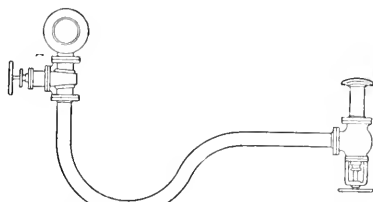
Boiler and header connection when header is higher than in Fig. 1
